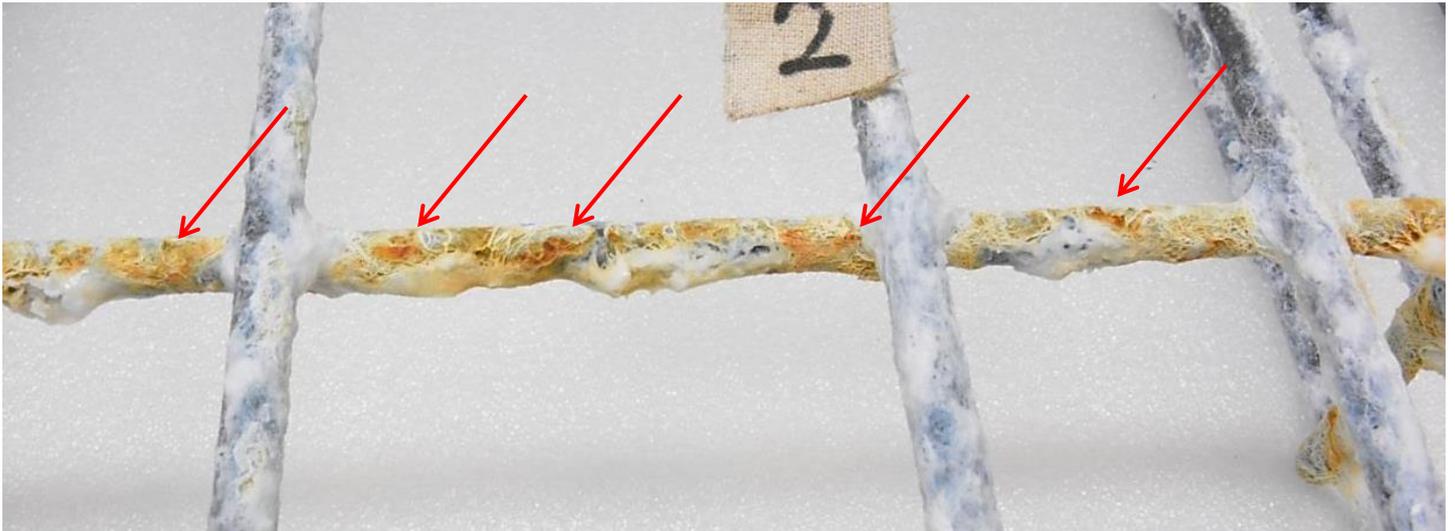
Close-up picture on sample 1 after 240h of testing. Example(s) of base metal corrosion is marked with arrow(s).
